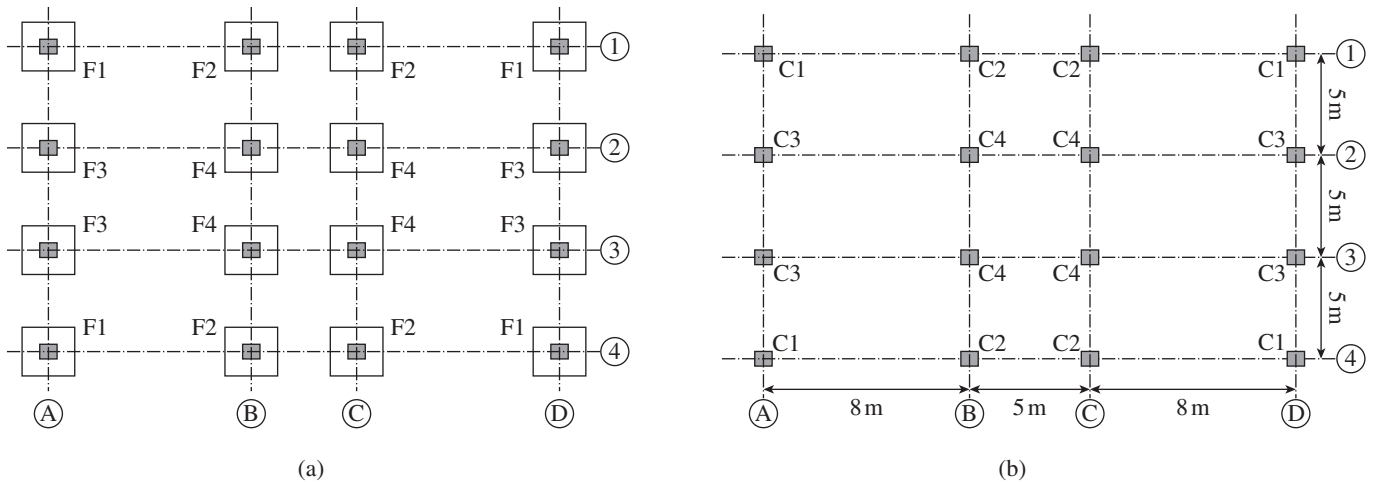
Foundation and column layouts (a) Foundation layout (b) Column layout
